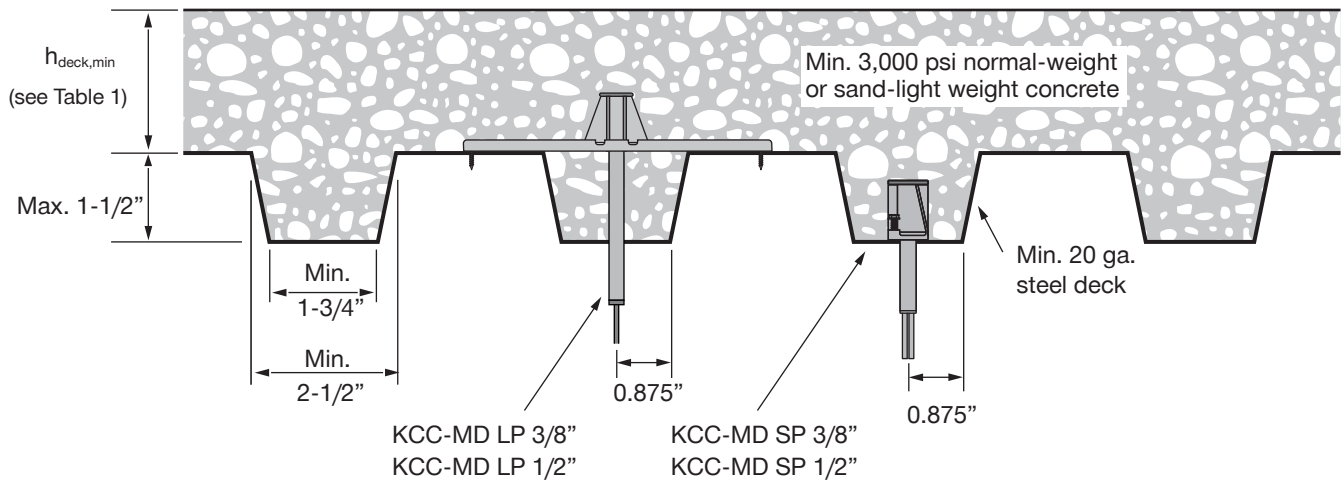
C — Installation of KCC-MD inserts in the soffit of concrete filled metal deck floor and roof assemblies-over lower flute (B-deck)
